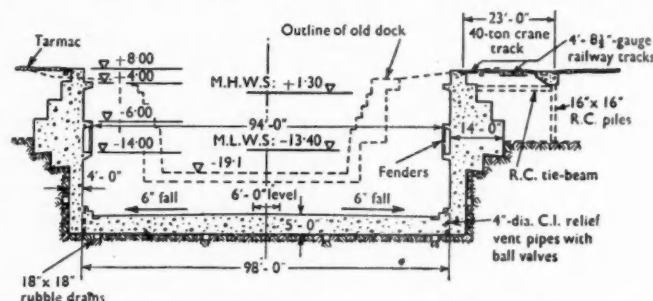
Cross section of Greenwell's No. 1 Dock.
